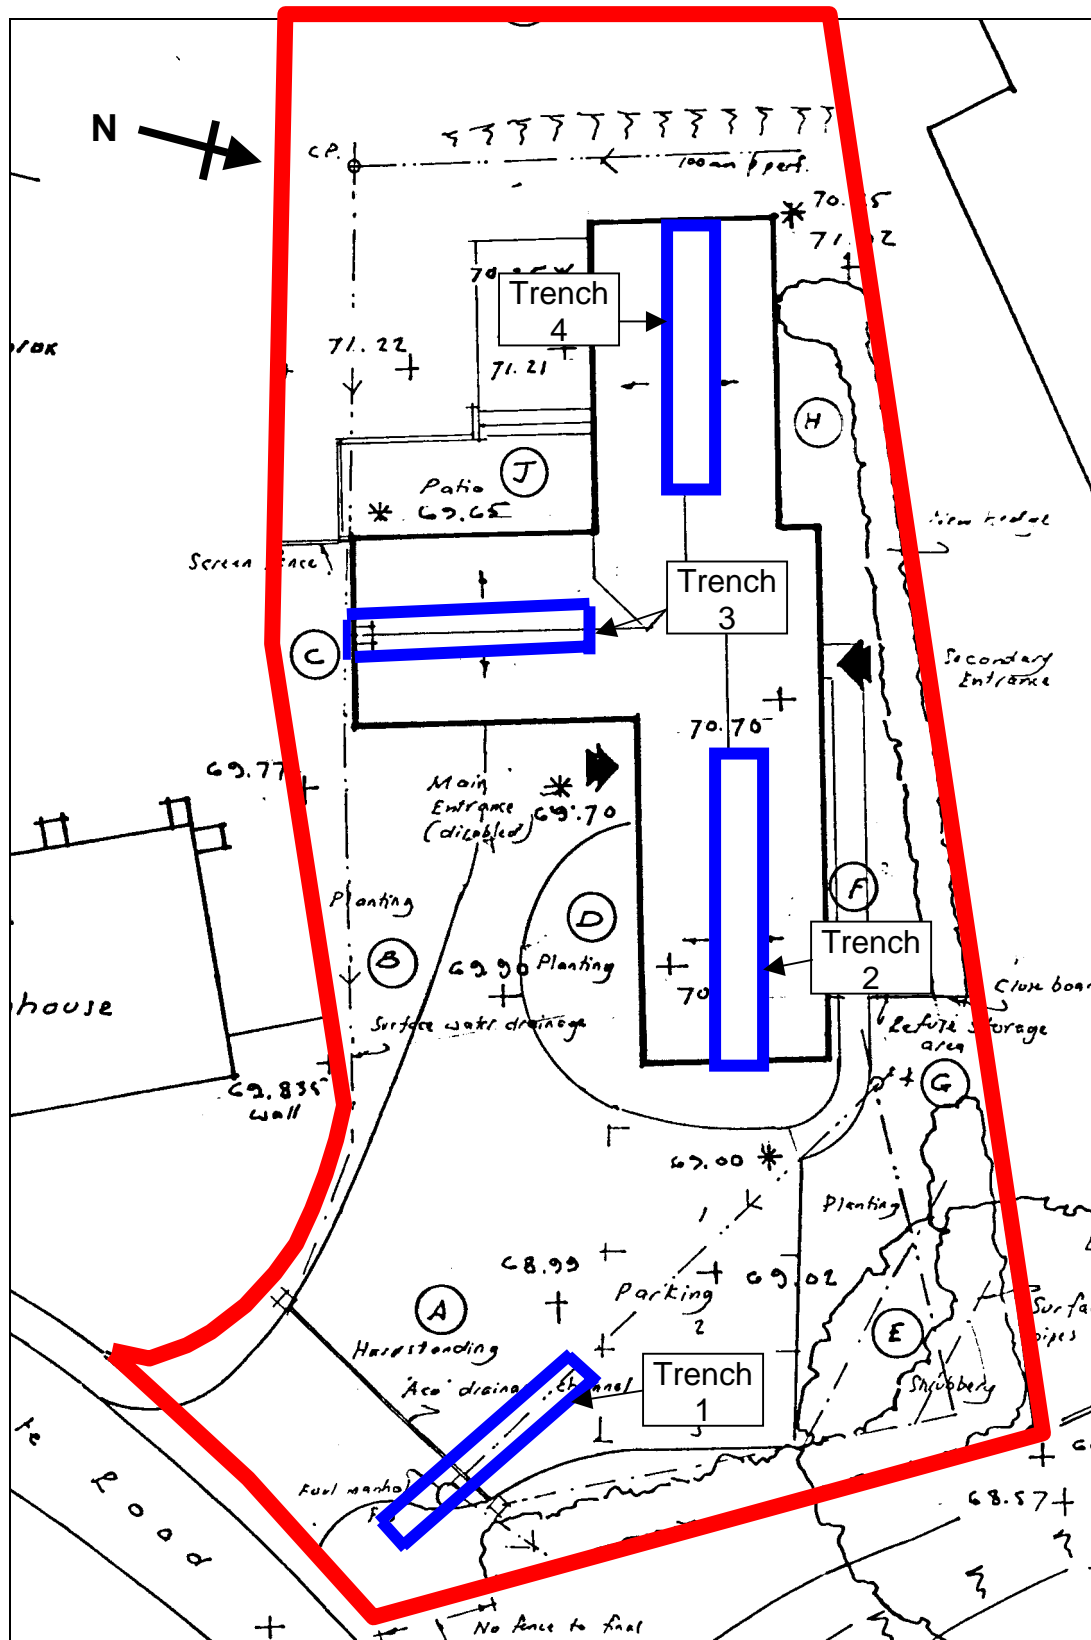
Site plan showing the proposed development with indicative trench locations (*scale 1:200 approx*)
